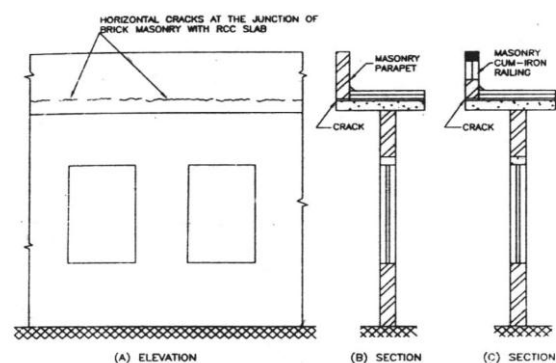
Horizontal crack at the base of a projecting RCC slab-supported brick-masonry parapet.
